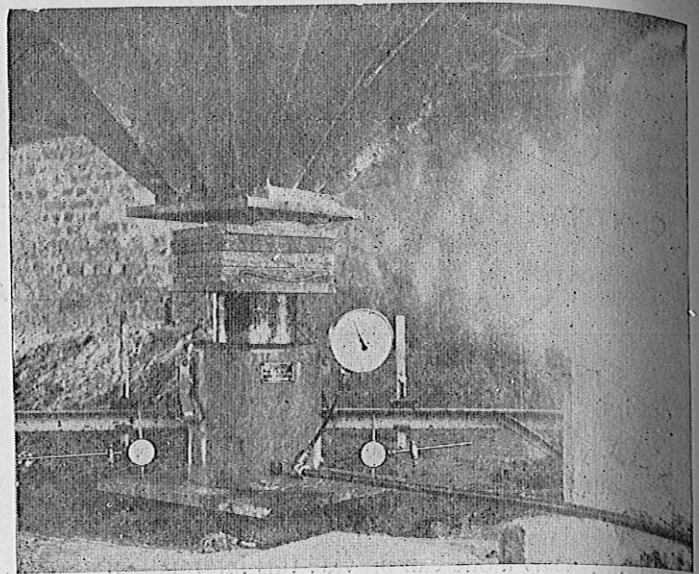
CLOSE UP OF TEST ASSEMBLY WITH LOAD DISTRIBUTING FRAME
